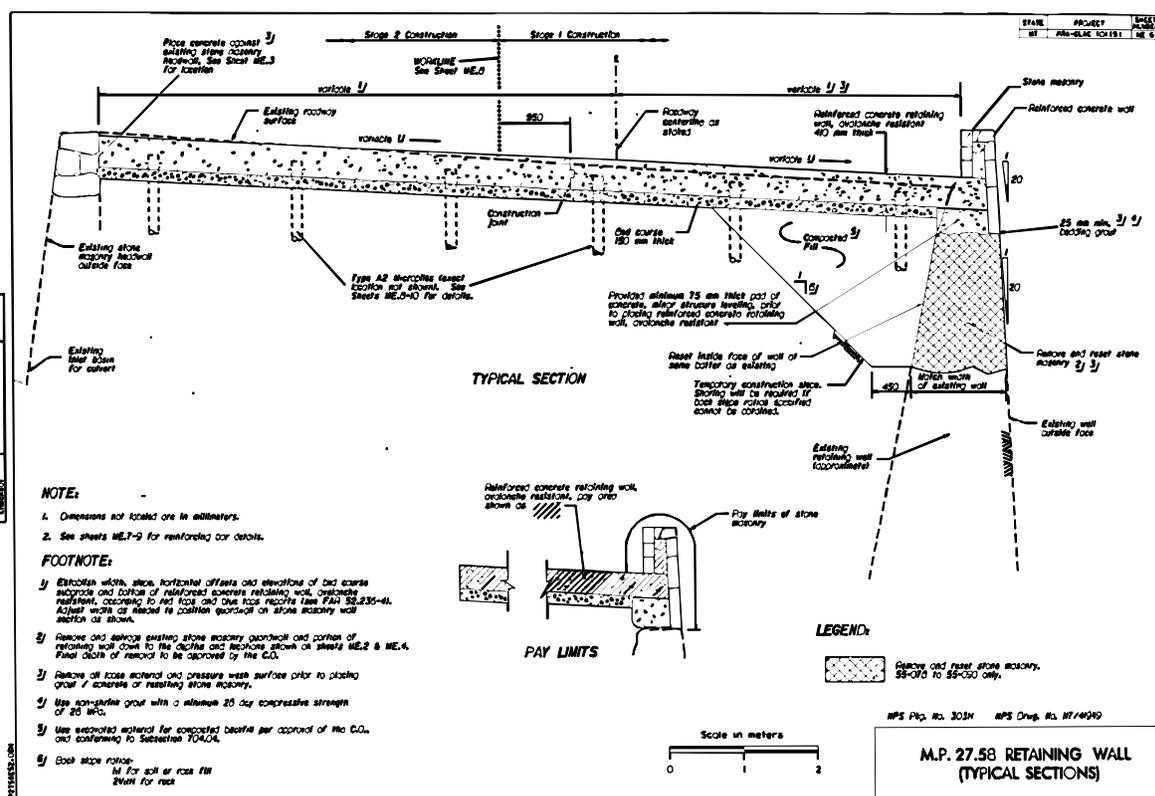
The FHWA design for retaining wall repair uses a concrete slab anchored with micropiles
